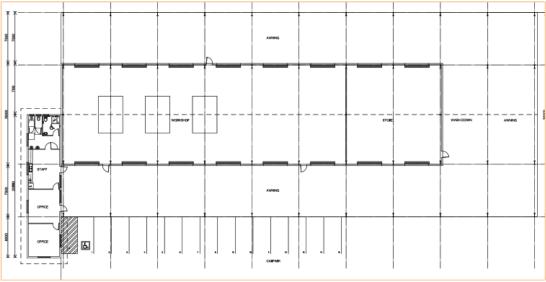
Workshop and Office Space Plans. Source: PD Designs
